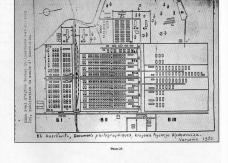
Busleitung drawing 3764 [PMO file BW 2/38]
